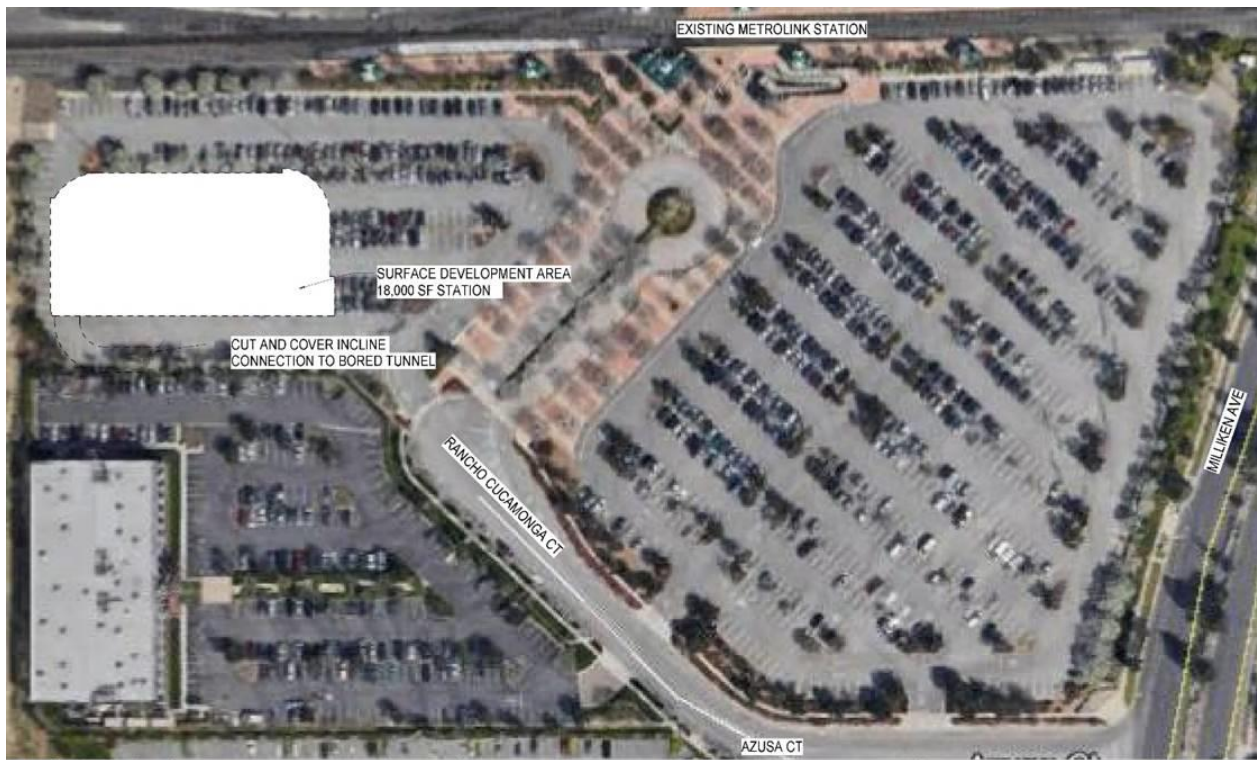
ONT Airport Stations Proposed Conceptual Station Plan
